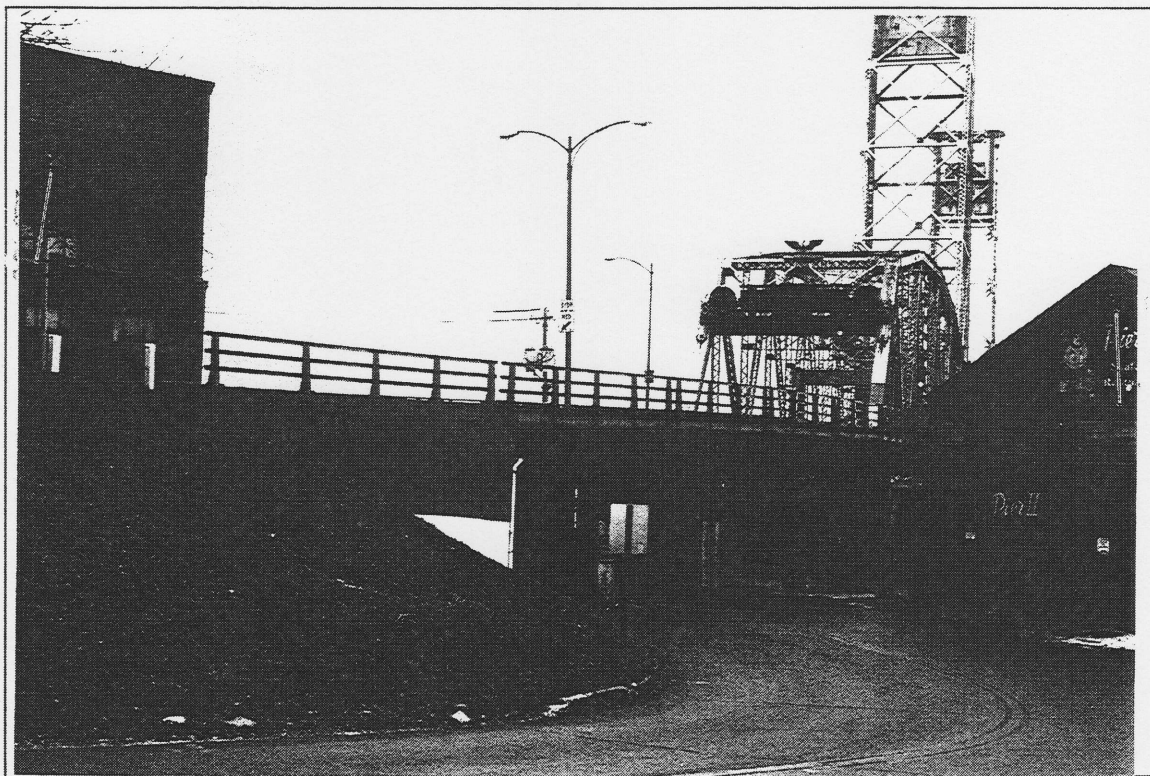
Portsmouth Approach East Elevation Roll: 2 Frame: 4 Direction: NW
